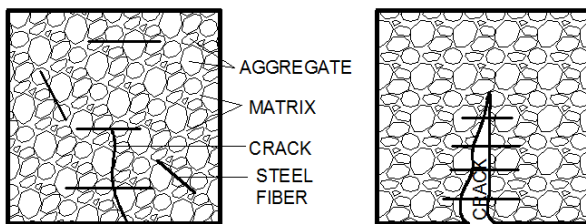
Illustration of cracks in high strength concrete with the addition of SFWT
